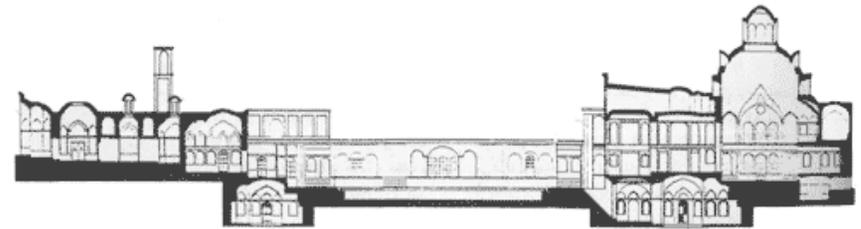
North-South section and plan of of Boroujerdi House in Kashan, Esfahan, example of four seasons houses in hot and dry climate
